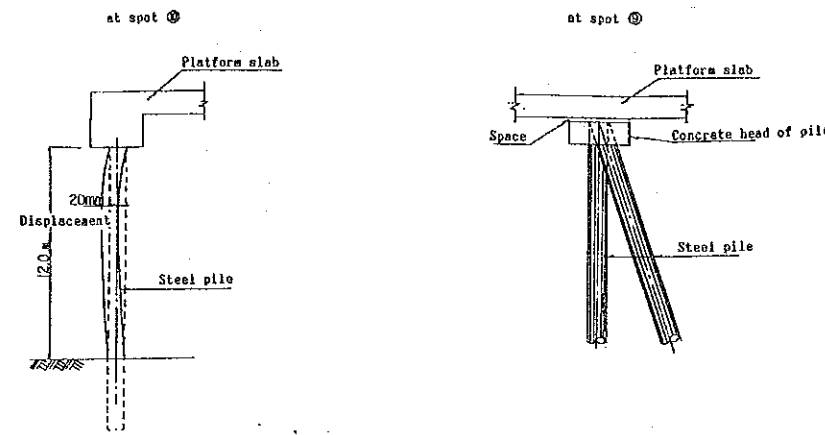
Detail of Deformed Spots at Berth No. 11
